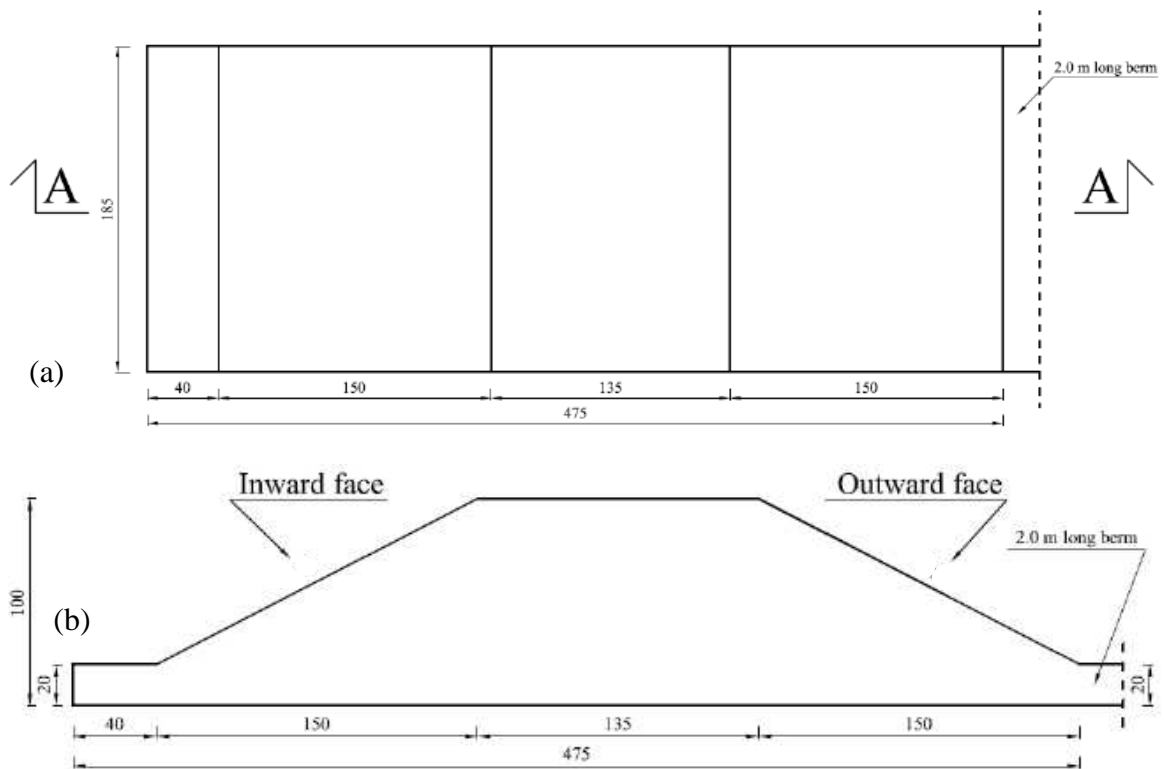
(a) Plan view (b) Cross-section A-A of the embankment (all dimensions in cm)
